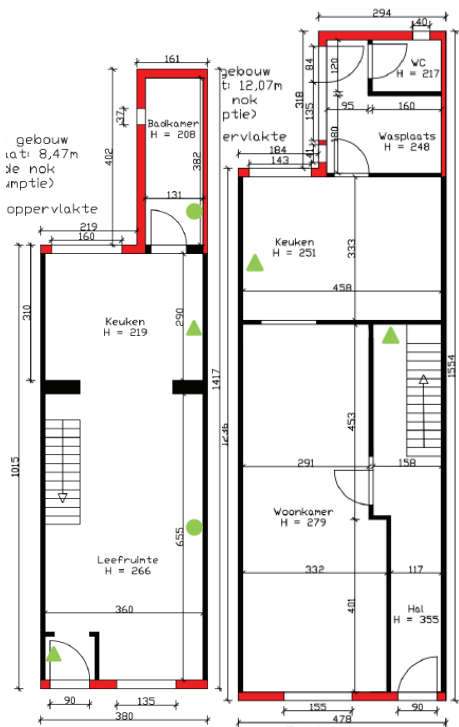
Grond floor plan of dwelling A (left) and C (right)
